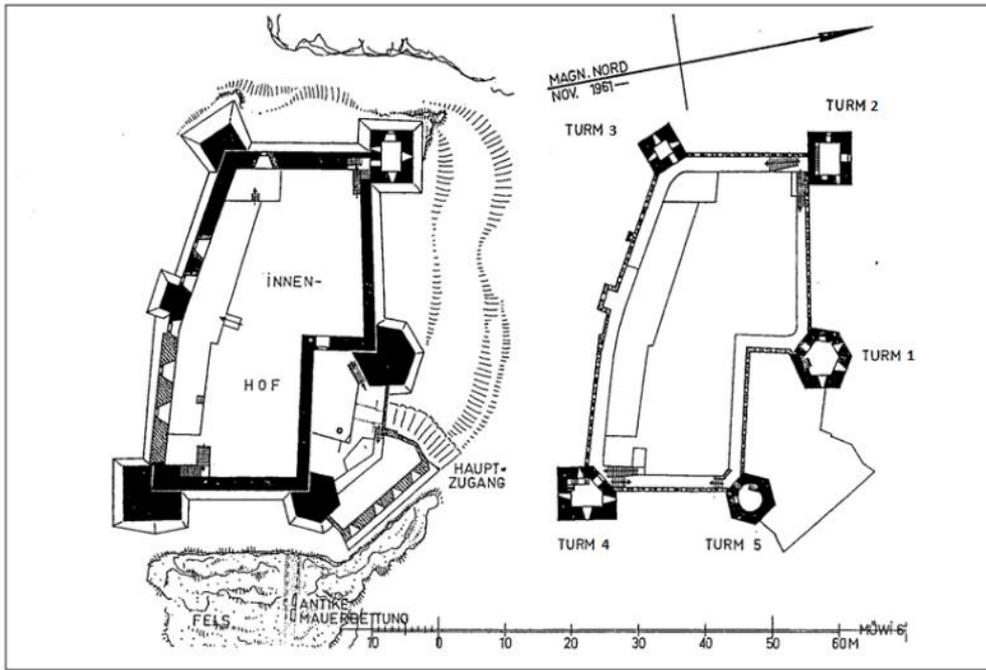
Floor plans of Çandarlı Castle (Müller-Wiener, 1962, p. 107)
